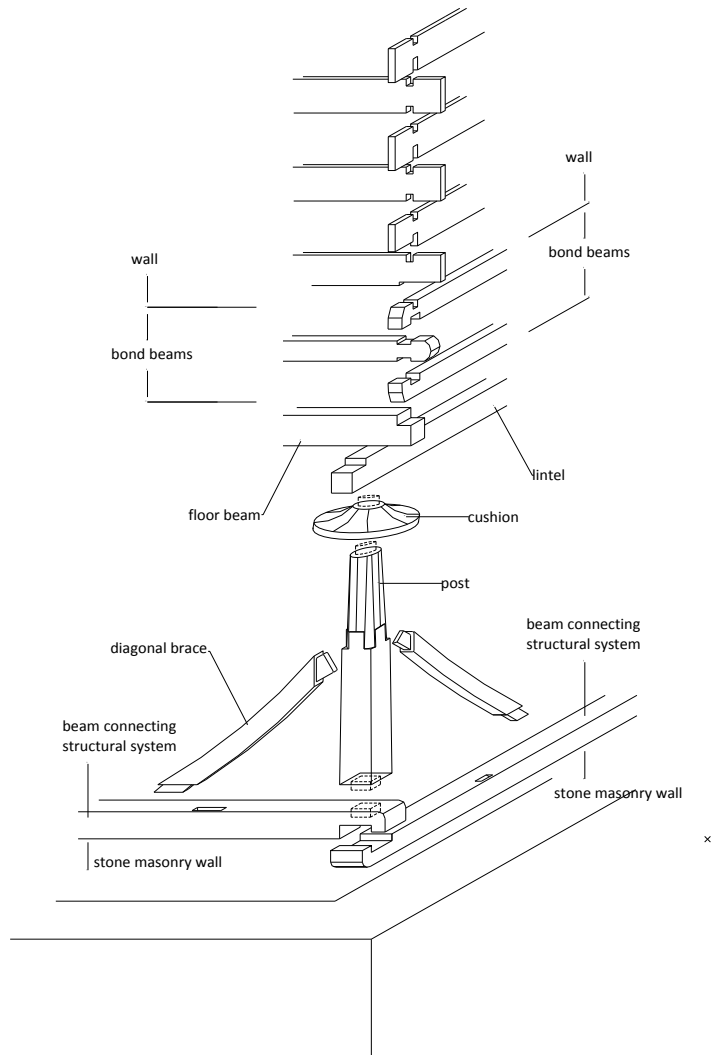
Construction detail of a composite carpentry system set on stone masonry wall
